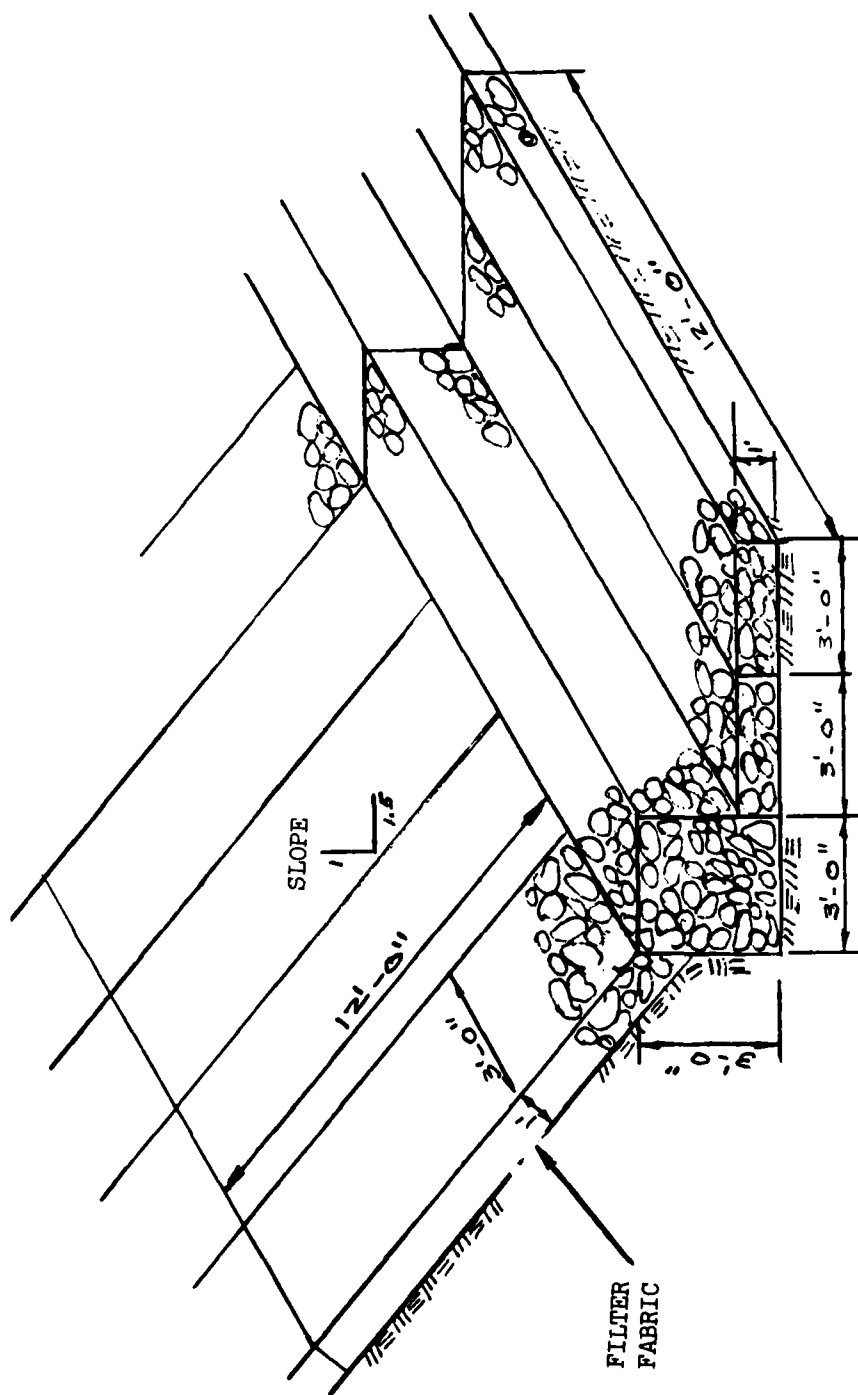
Typical cross section of revetment placed on Little Rockfish Creek, Hope Mills, N. C. (adapted from Little Rockfish Creek, Hope Mills, N. C., Slope Protection, Cross Sections, Drawing No. RC 102-02-28, Sheet 2 of 2, SAW, 19 Sep 1975)
